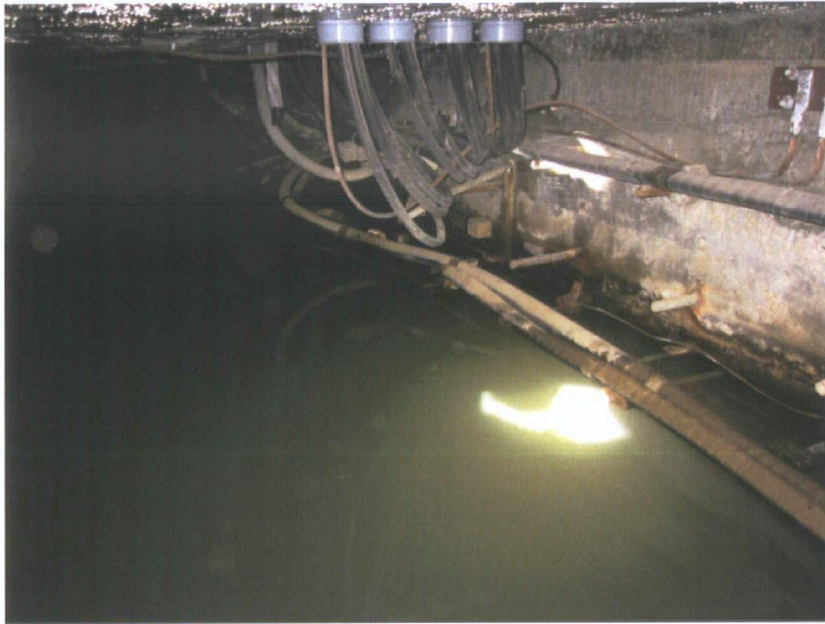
Electrical manhole near northwest corner of transformer pad, view looking east.
